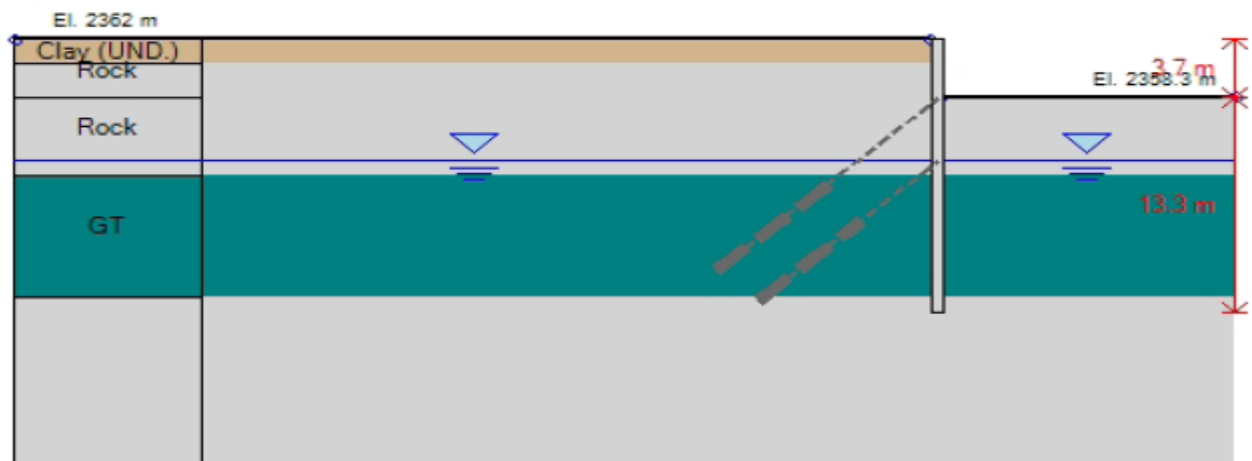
3.7m cantilever excavation depth for stages for 1.5 m spacing and 1<sup>ST</sup> anchor level 3.7m
